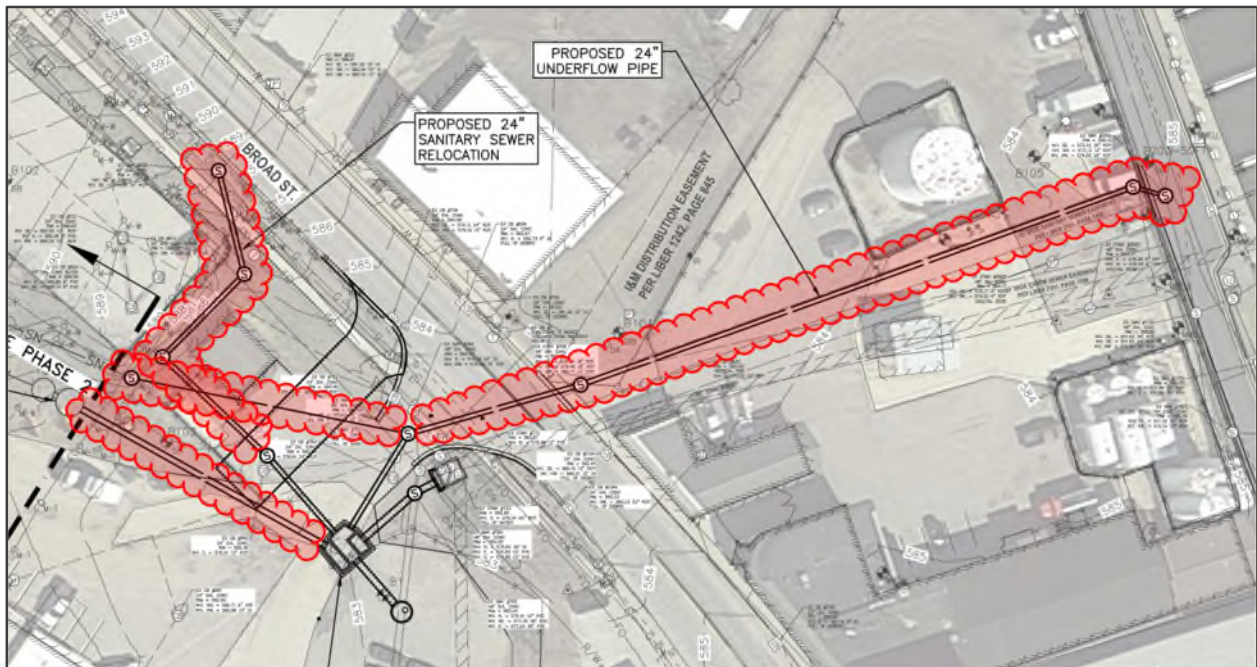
Highlighted structures and sanitary sewer pipe to be supported on existing subgrades.
